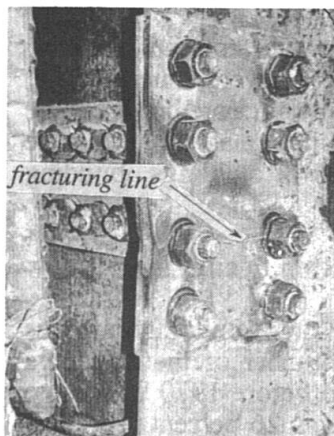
Fracturing of Splice Plate at Column Joint (after chipping concrete)
